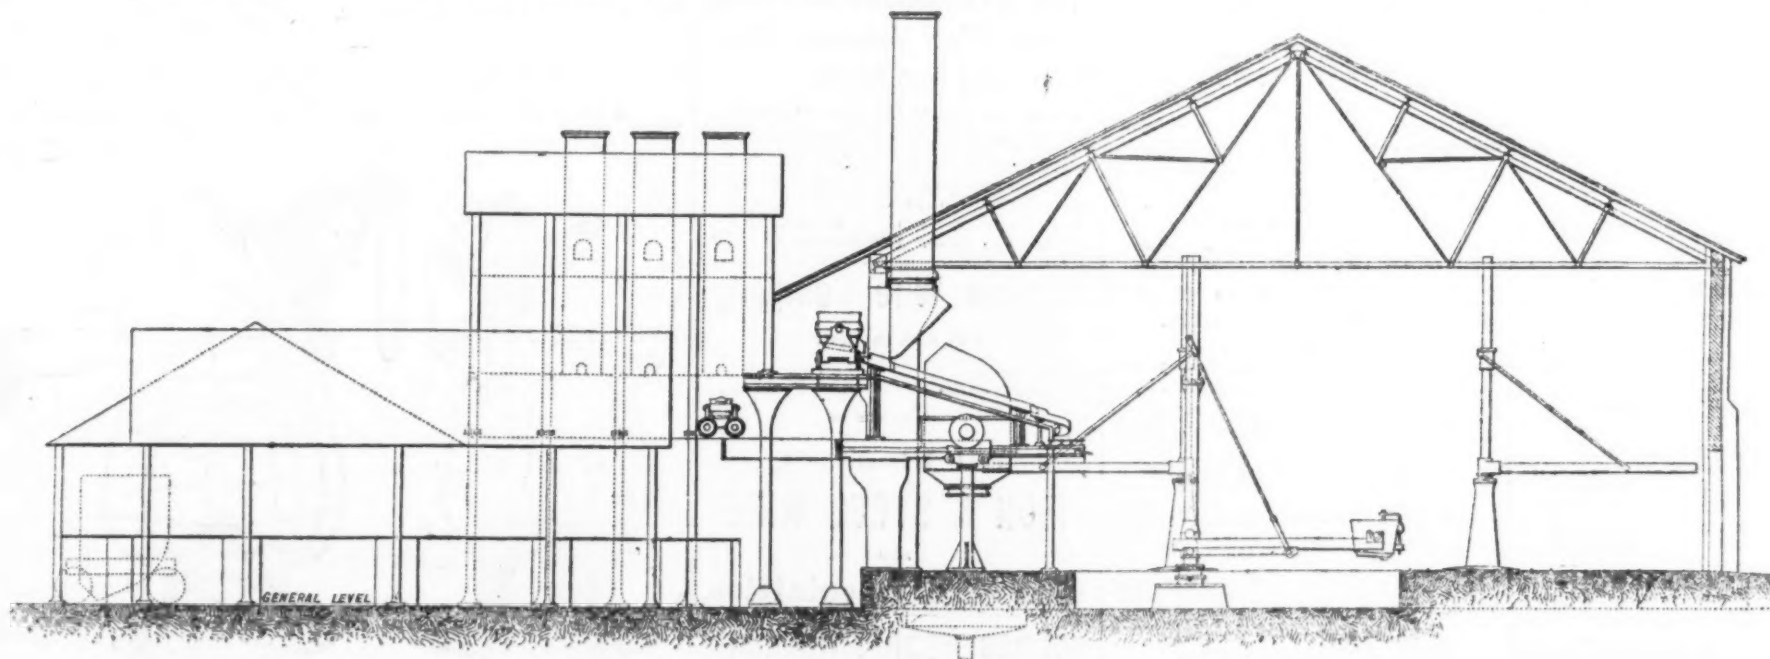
Elevation of a Bessemer Steel Plant for the Basic Process.
